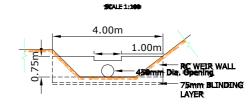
DETAIL C (See Drawing No. 2607) TYPICAL SECTION THROUGH INTERCELL BERM
